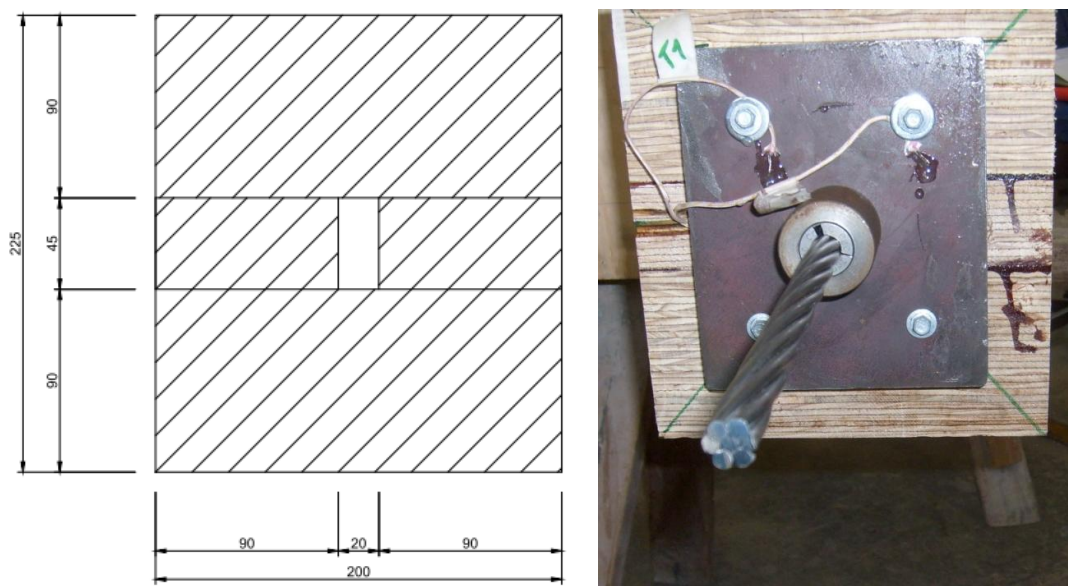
Anchorage member cross-section (left), unprotected anchorage (right)
